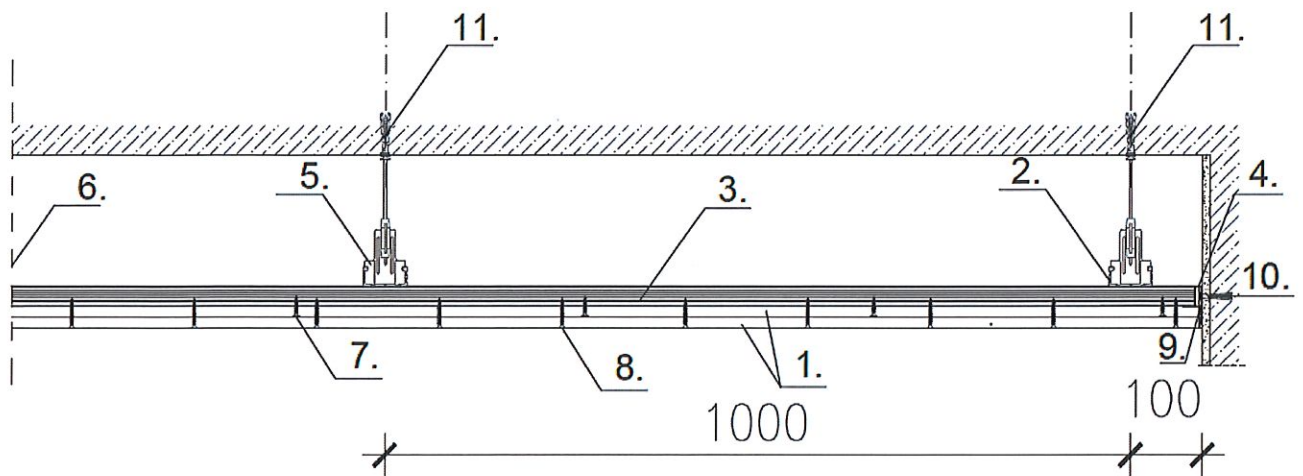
View of the suspended ceiling – two level cross construction with hangers ES or ES plus
